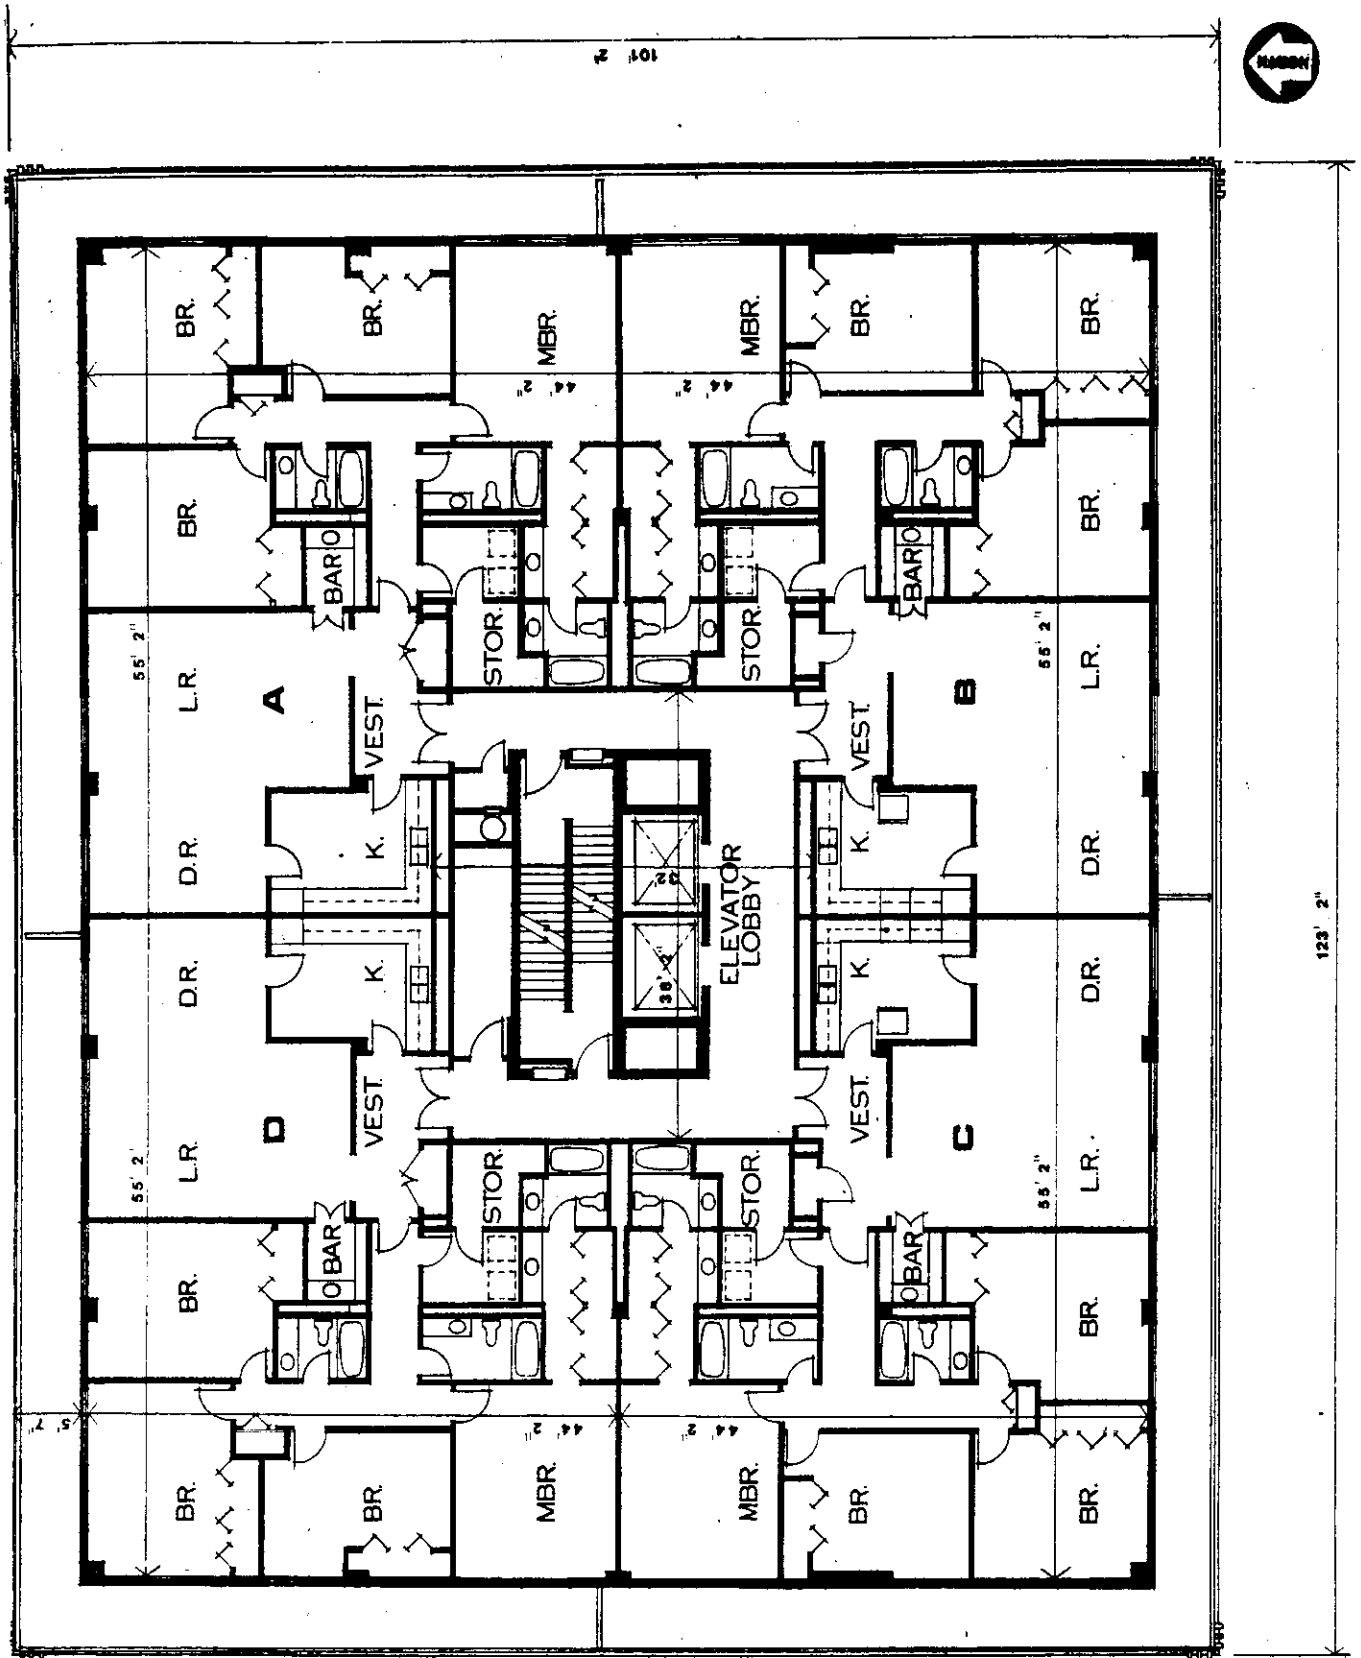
Floor Plan for 18<sup>th</sup> and 19<sup>th</sup> Floors
